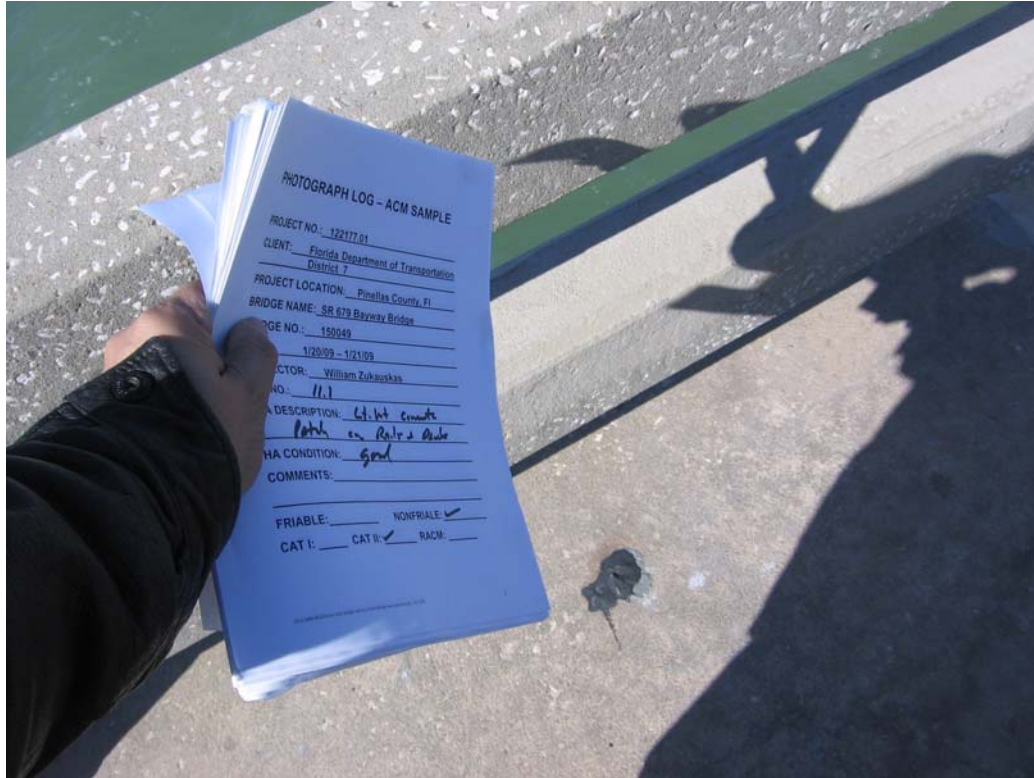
01/21/09 – SAMPLE 10.2 – HA 10
